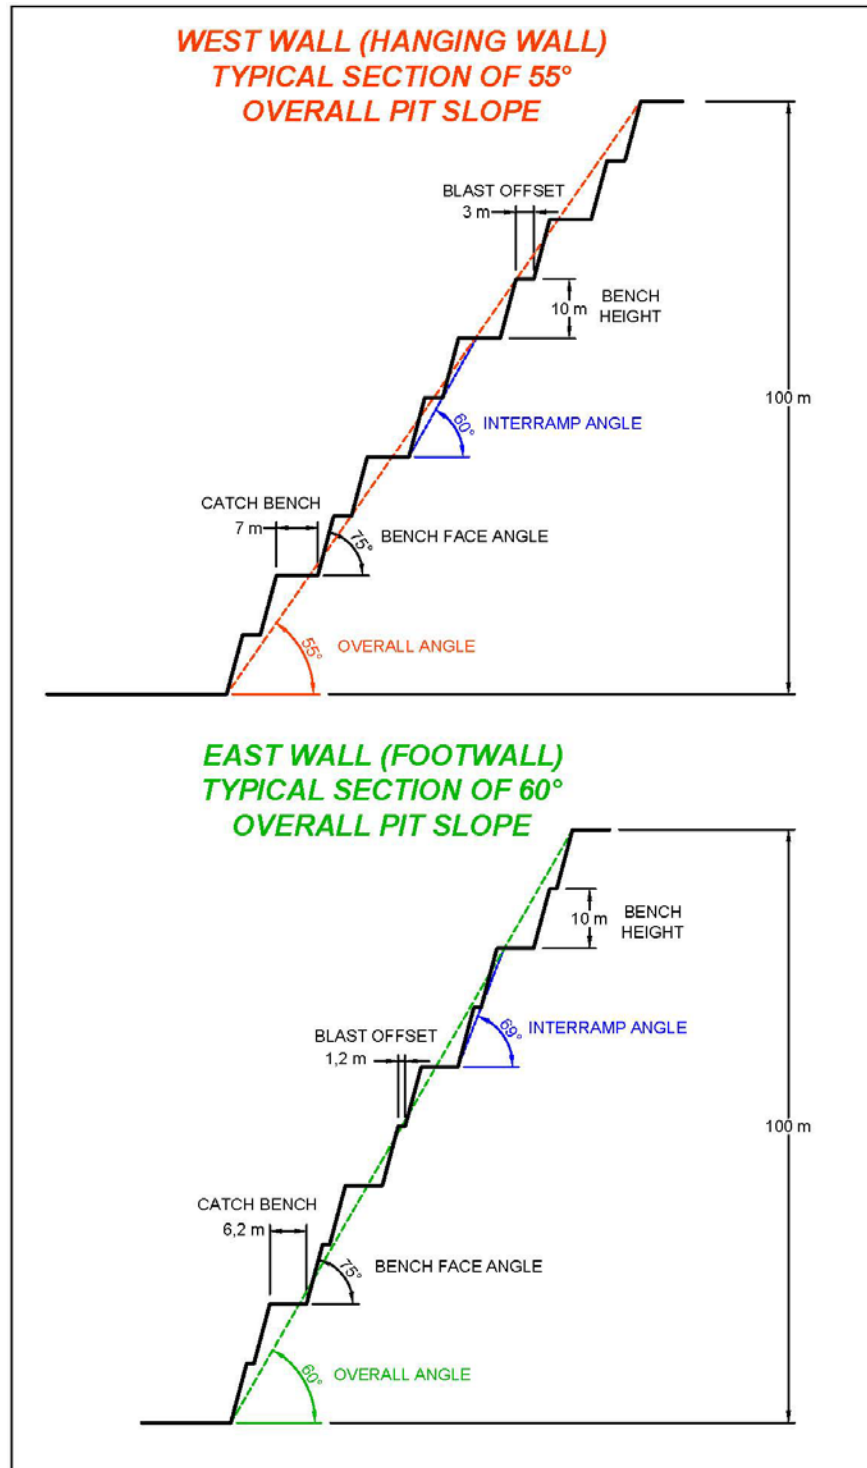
Wall sections of proposed Tony Block pit walls.
